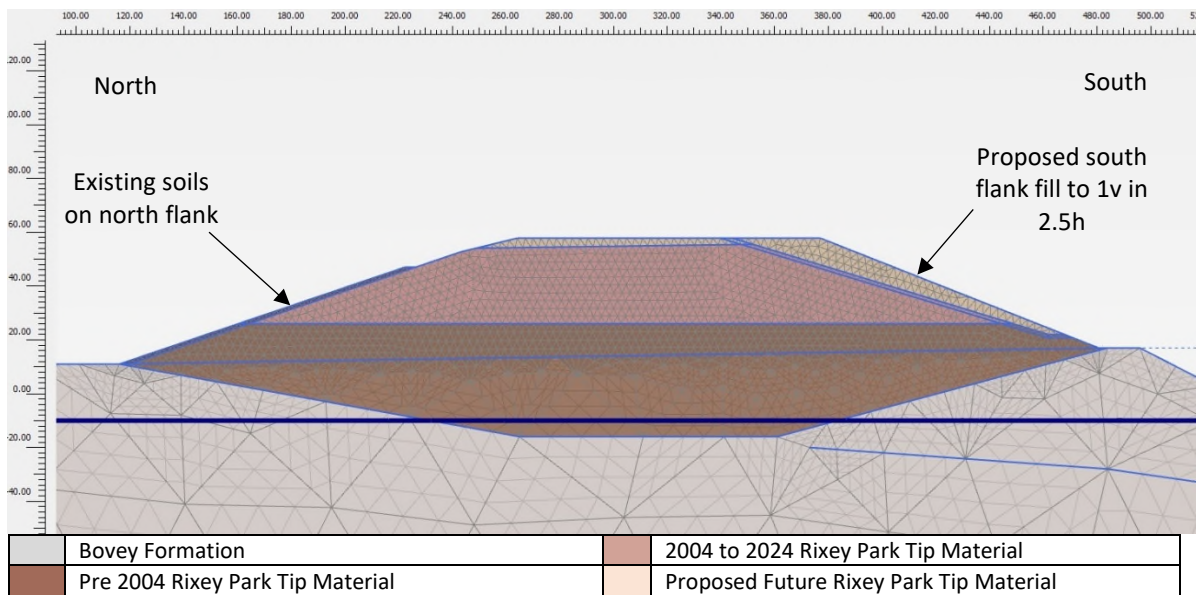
Model 1 cross section, north to south, up to top of sub-grade level. Cross section location on Figure SRA14
